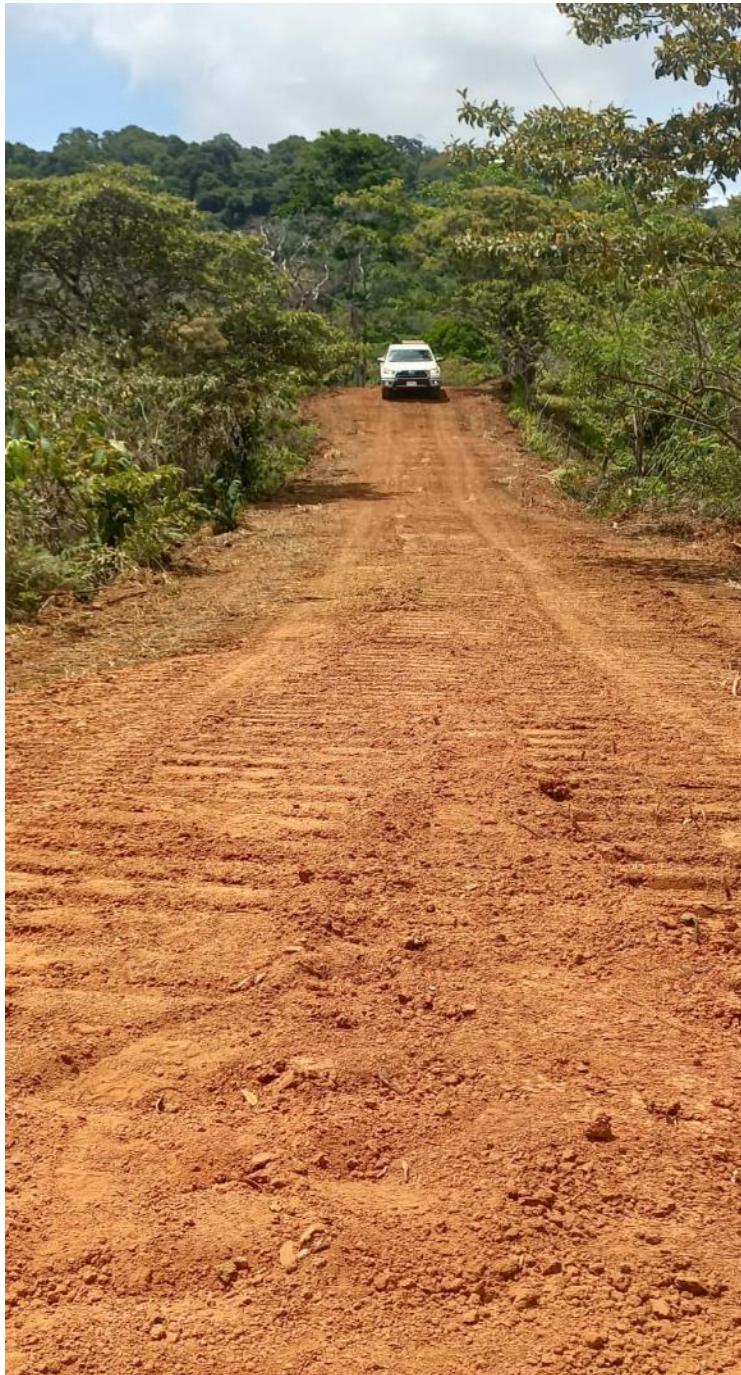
CROSSINGS AND EXTERNAL ROAD REHABILITATION TOWARDS THE FARMS LASTENIA.
